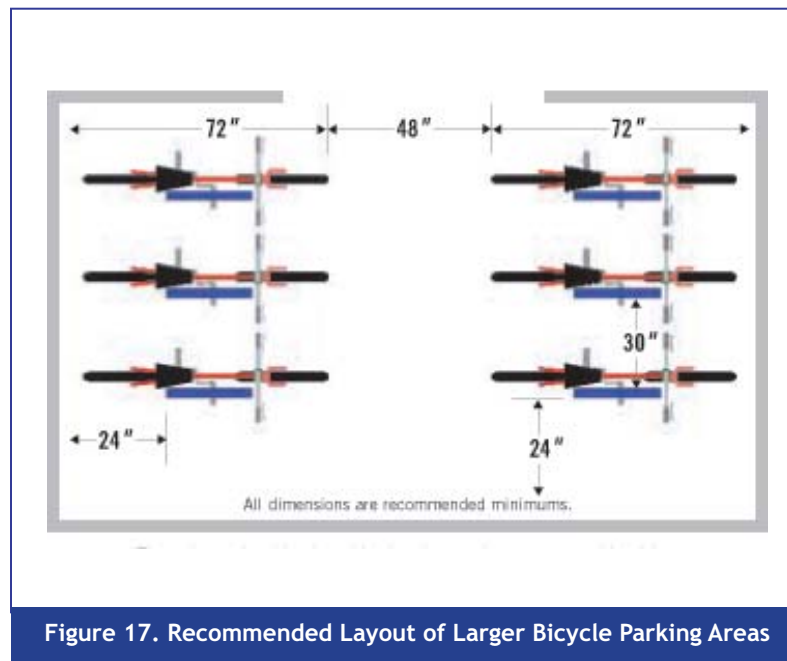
Recommended Layout of Larger Bicycle Parking Areas
